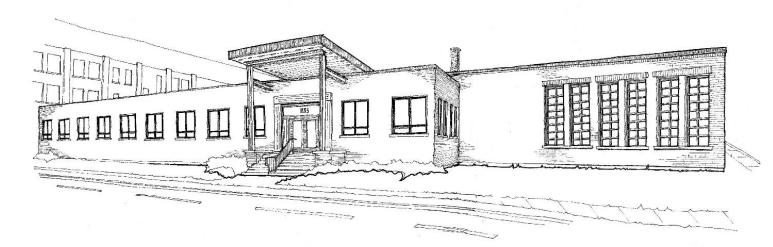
1153 -1155 Dundas Street rendering - Dundas Street perspective
